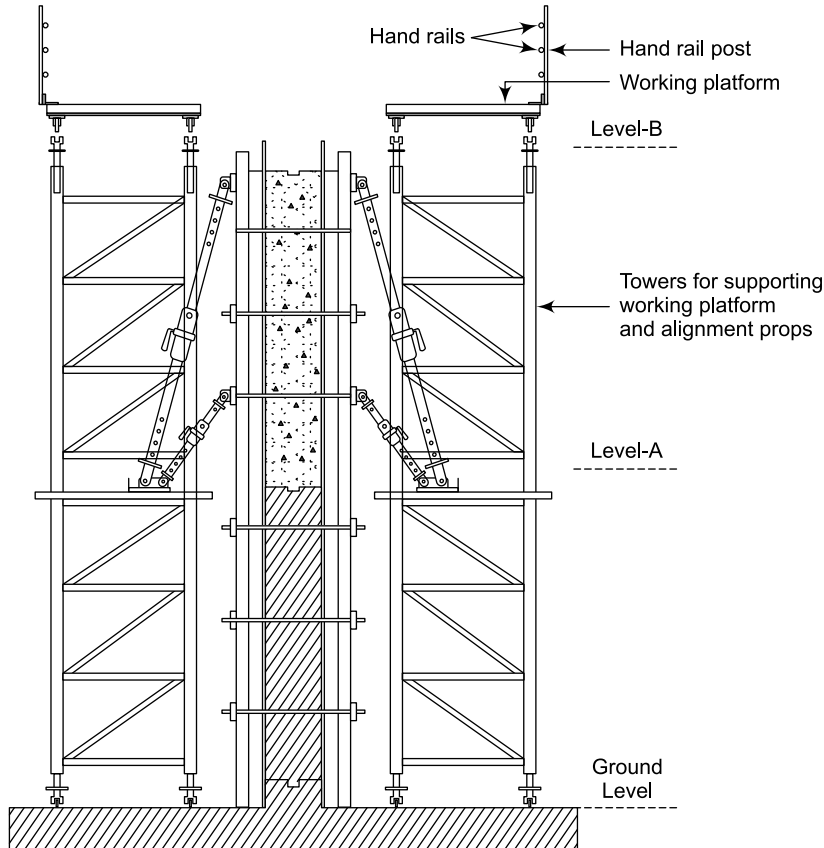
(b) Step 2 of Wall Formwork—Casting of Second Lift of the Wall.
